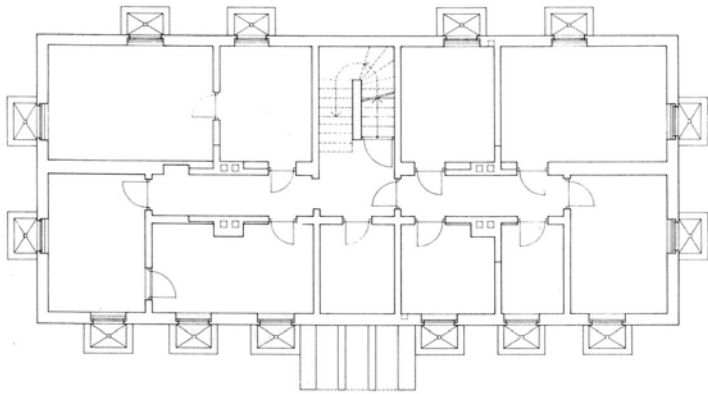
The original basement plan. Note the light wells that let light into the basement.
